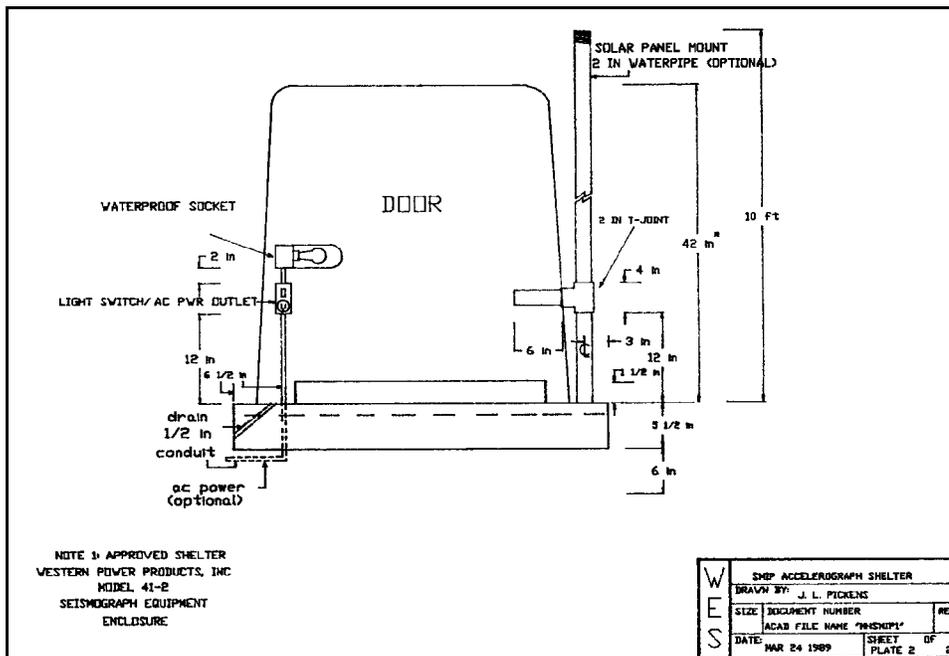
Plans of Western Power Products, Inc. model 41-2 equipment protective enclosure
